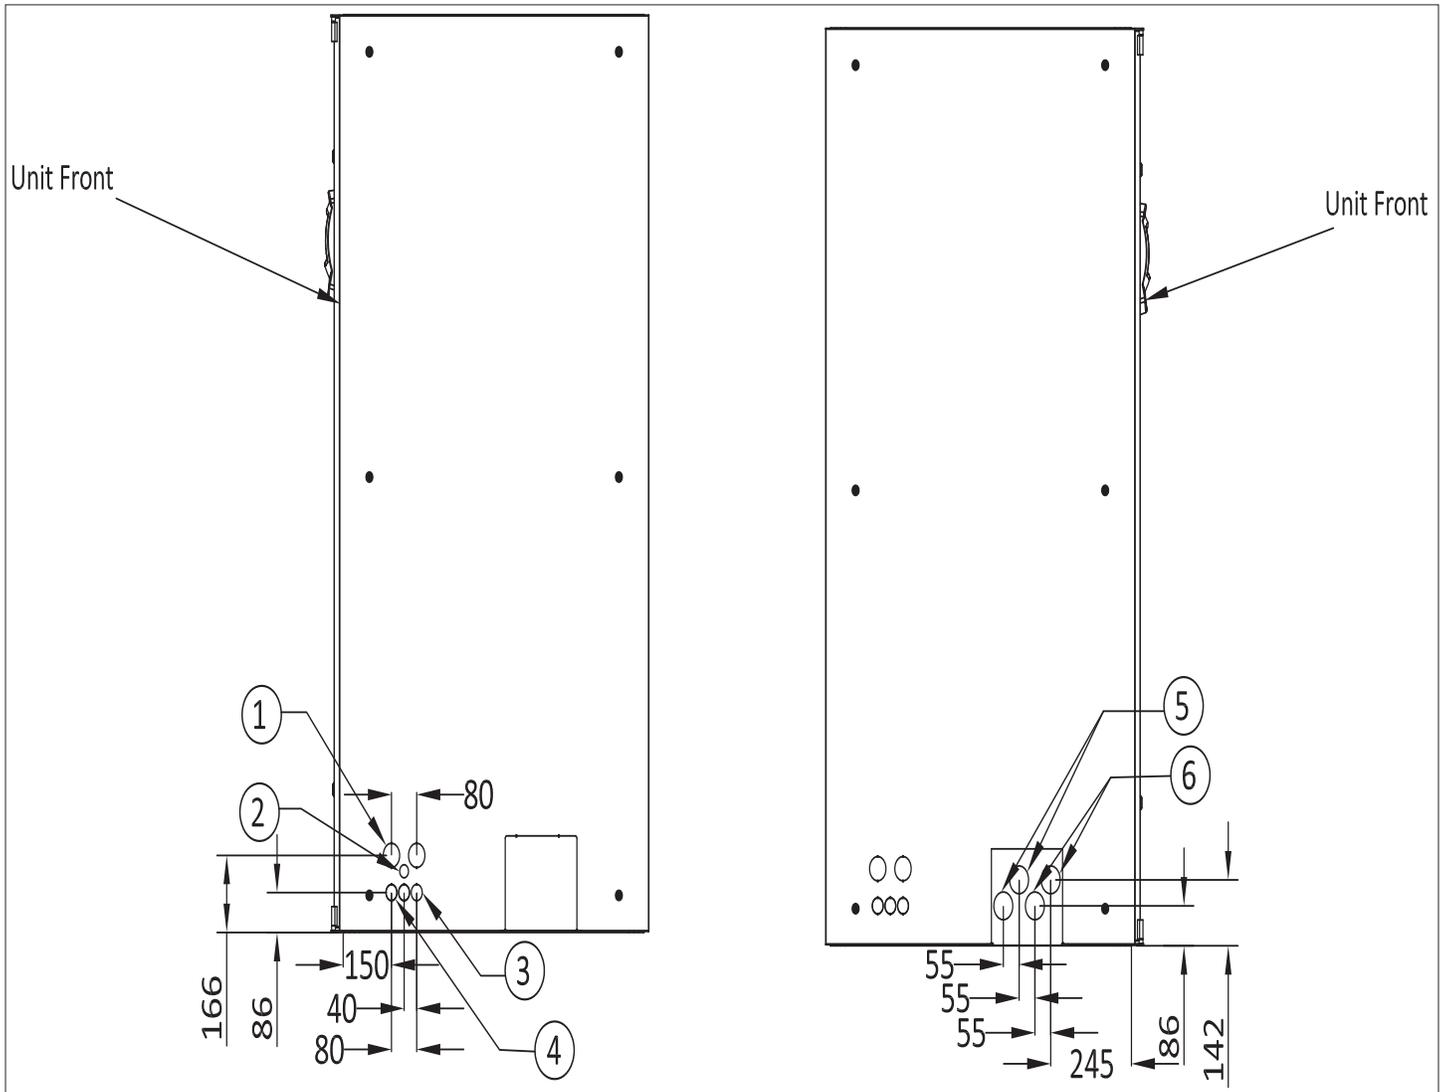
The Position of Pipe Bottom Outlet of Single Cabinet Unit (unit: mm)
